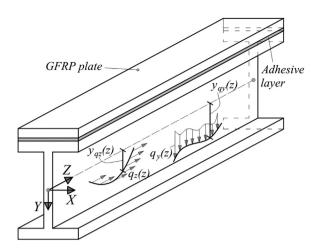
A GFRP-reinforced steel beam under the application of distributed loads.
